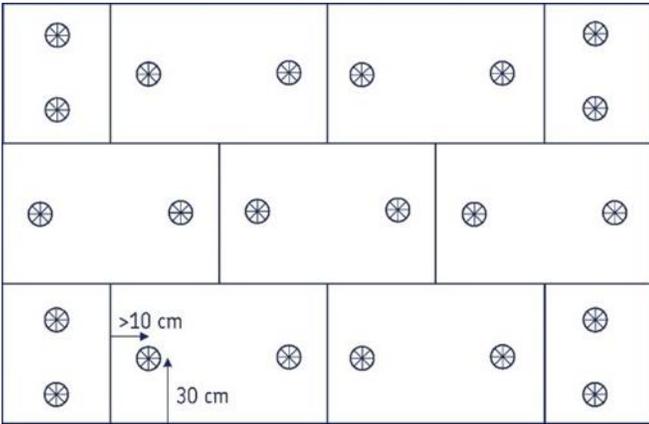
Detail on distribution of fixings by panels: In the high and low levels, 2 fixings will be installed distributed in each corner 10 cm from the ends. Panel detail installed with 90mm diameter washer fixings. © URSA Ibérica Aislantes S.A.
